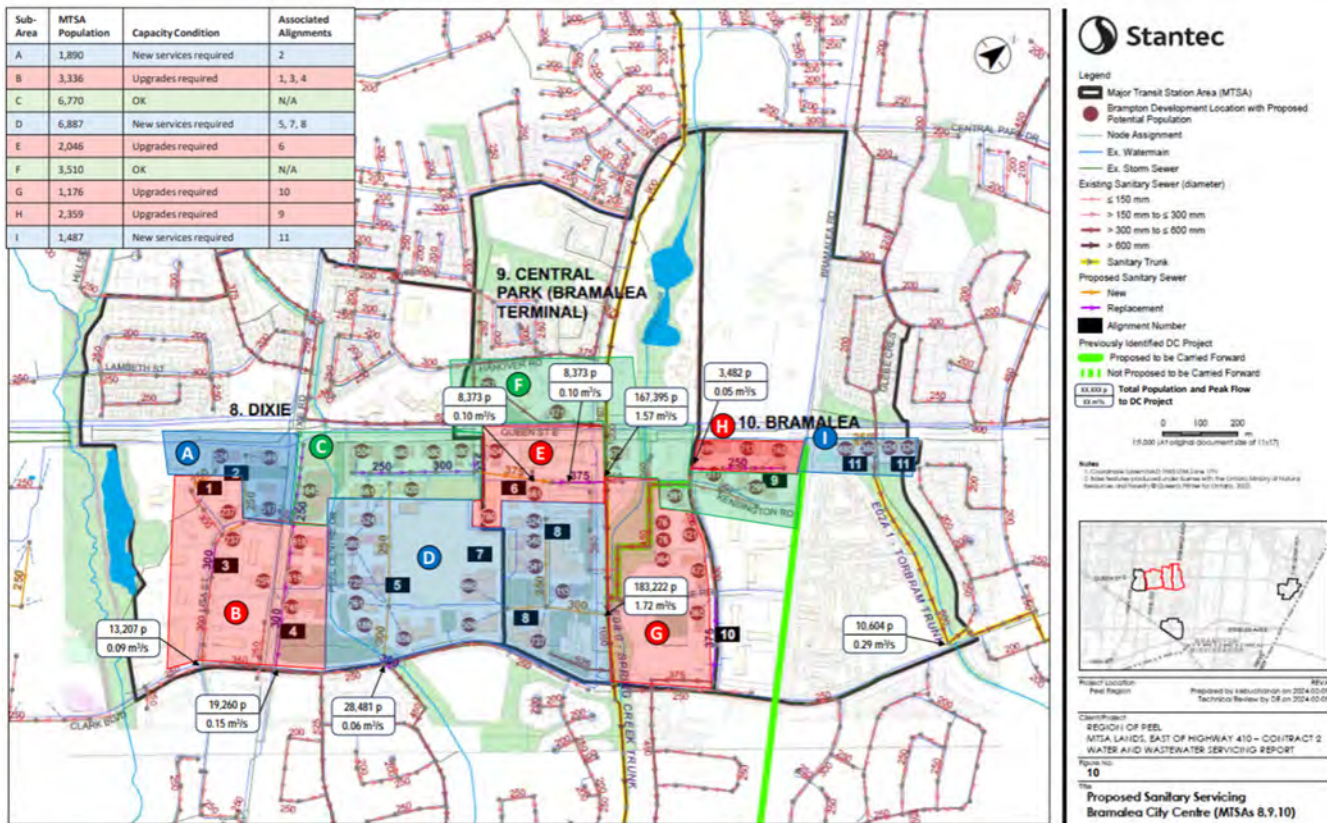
Stantec Preferred Wastewater Alternative (Dixie, Central Park, and Bramalea)
